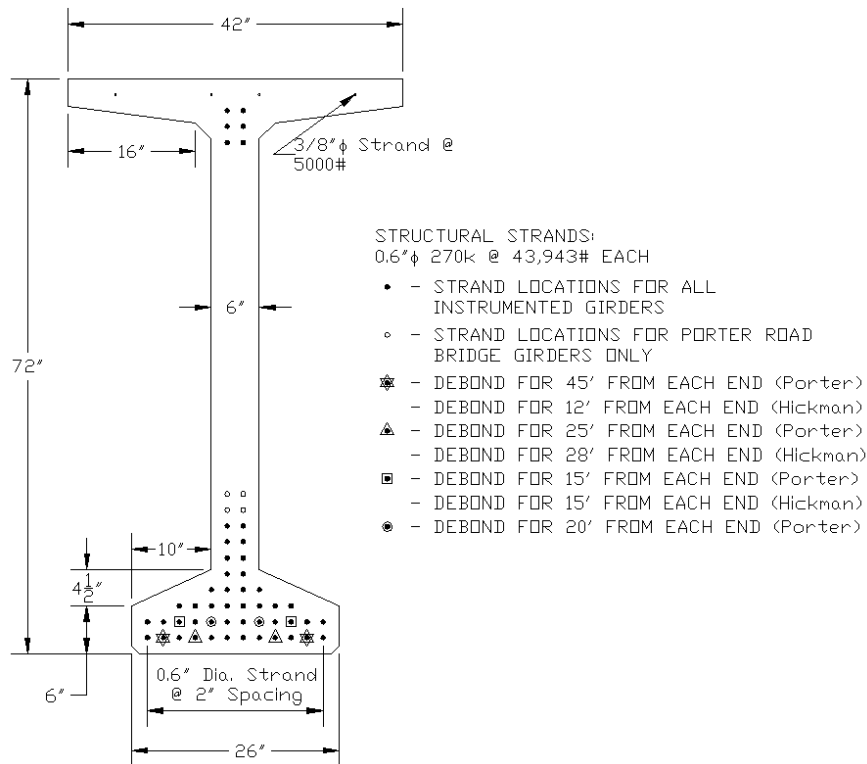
BT-72 Girder Cross-Section, Showing Both Strand Patterns Used in Instrumented Girders
